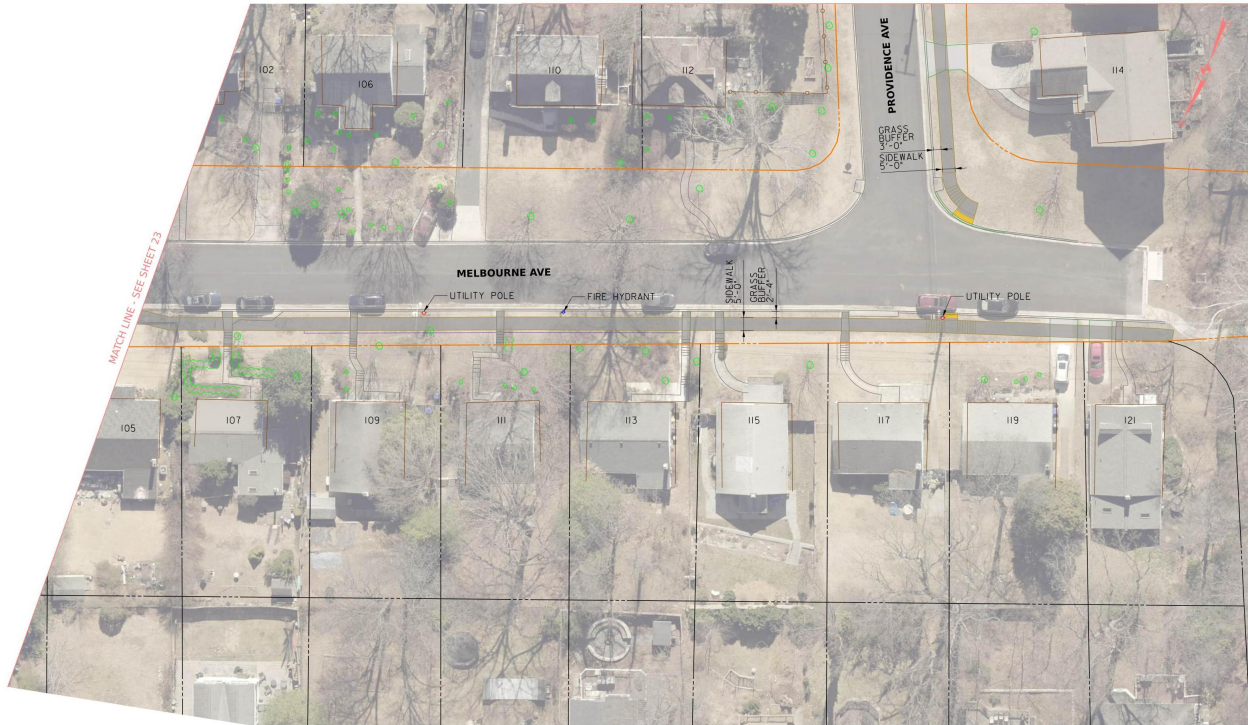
Plan view of proposed sidewalk improvements along Melbourne Avenue at Providence Avenue. The drawing overlays an aerial photograph of residential properties with lot lines, house footprints, and driveways. The north side of Melbourne Avenue shows a labeled grass buffer (3'-0") and sidewalk (5'-0") along Providence Avenue. Curb ramps with detectable warning surfaces are indicated at the intersection corners. Utility poles and a fire hydrant are marked along the corridor. Property boundaries, right-of-way limits, and driveway connections are delineated for houses numbered 105 through 121. Match line reference to adjacent sheet is shown at the project boundary.
